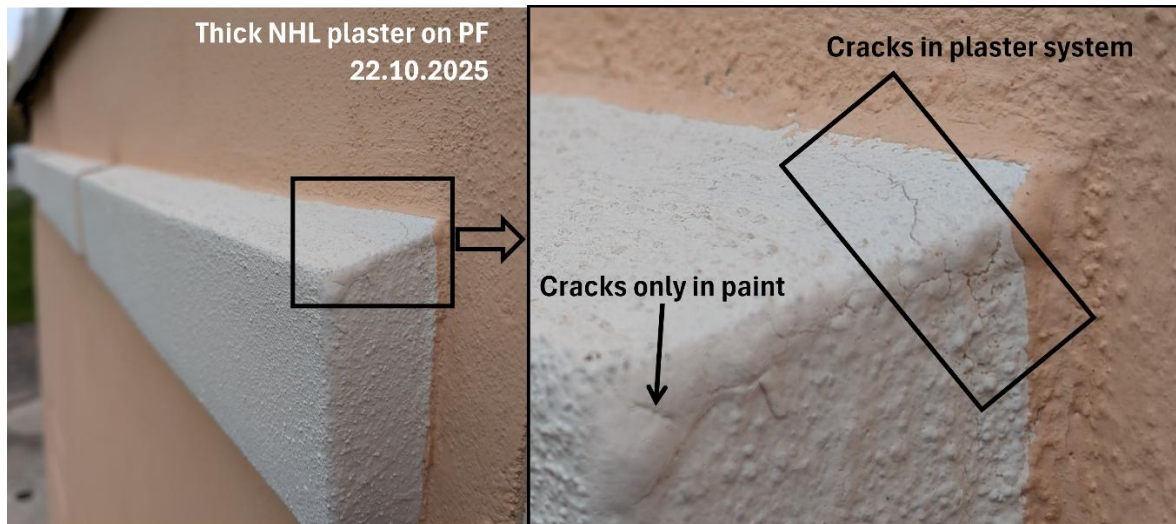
Small cracks observed at the corner of the cornice on 22 October 2025 on the south-facing façade with thick NHL plaster over PF insulation. The cracks may be the result of imperfect mesh installation around the cornice corners.
